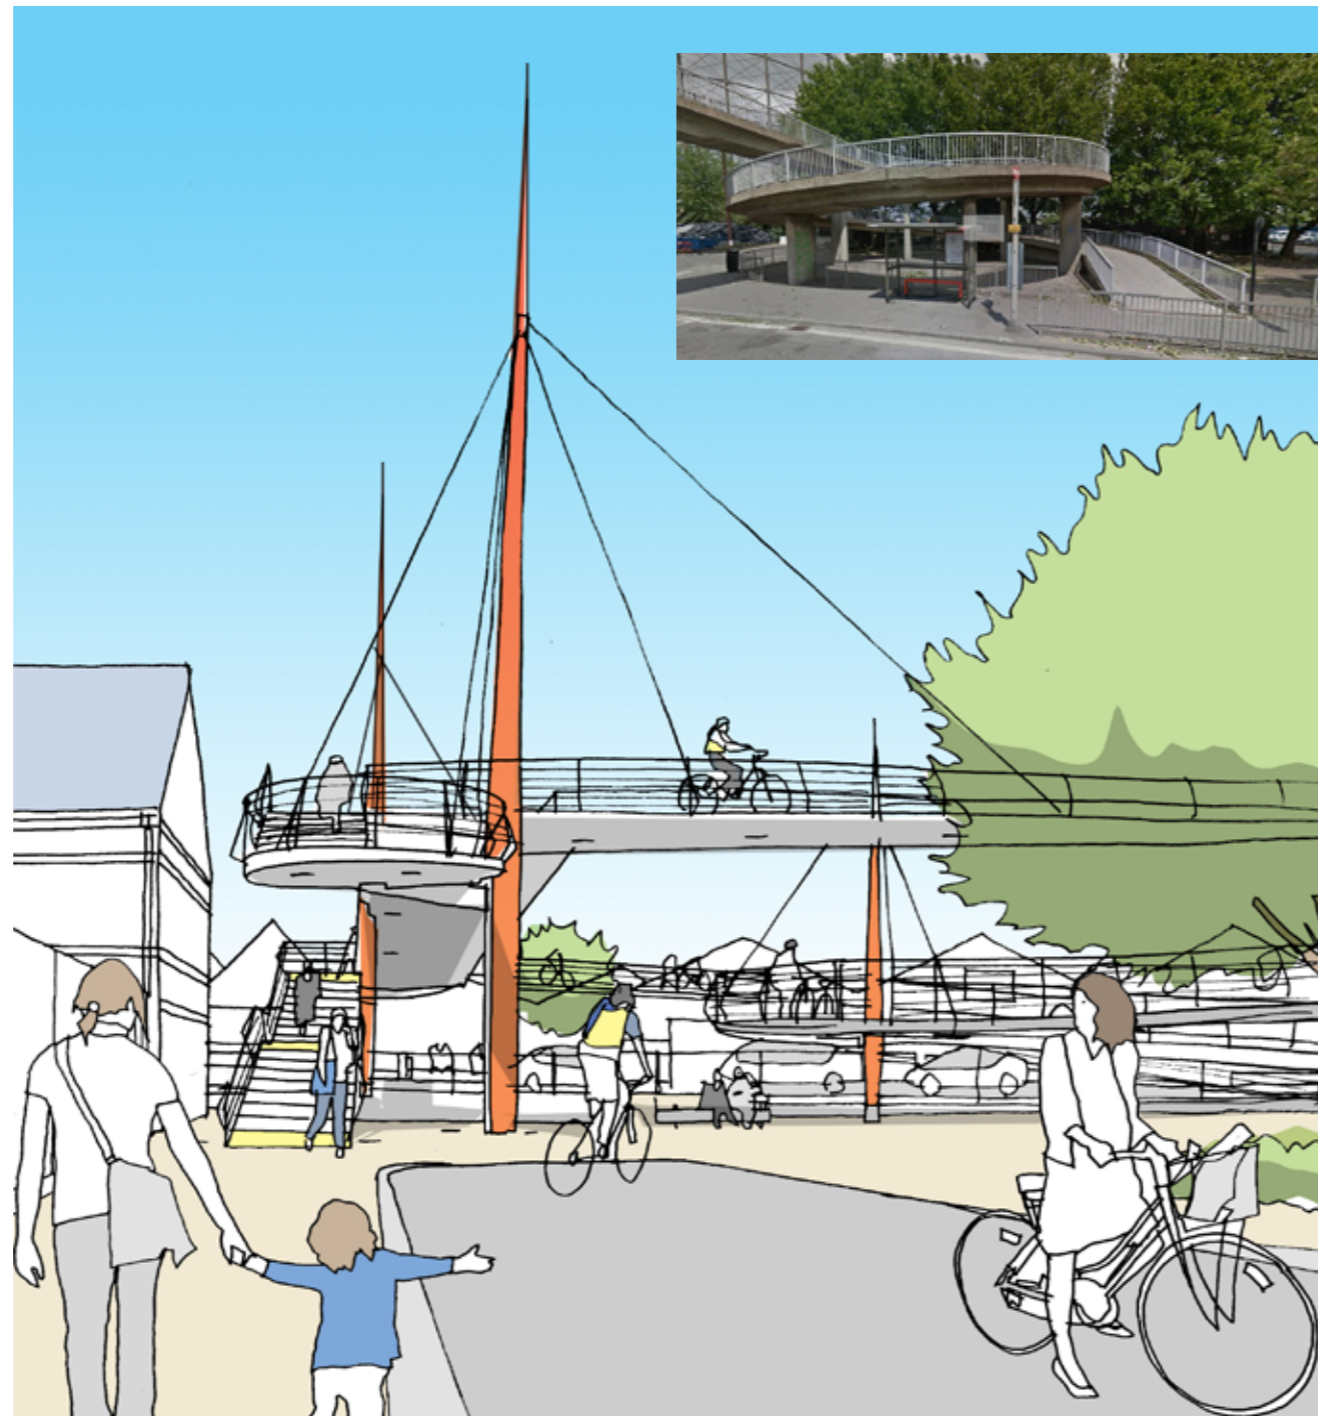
The existing Boord Street bridge (Source: Bing)
